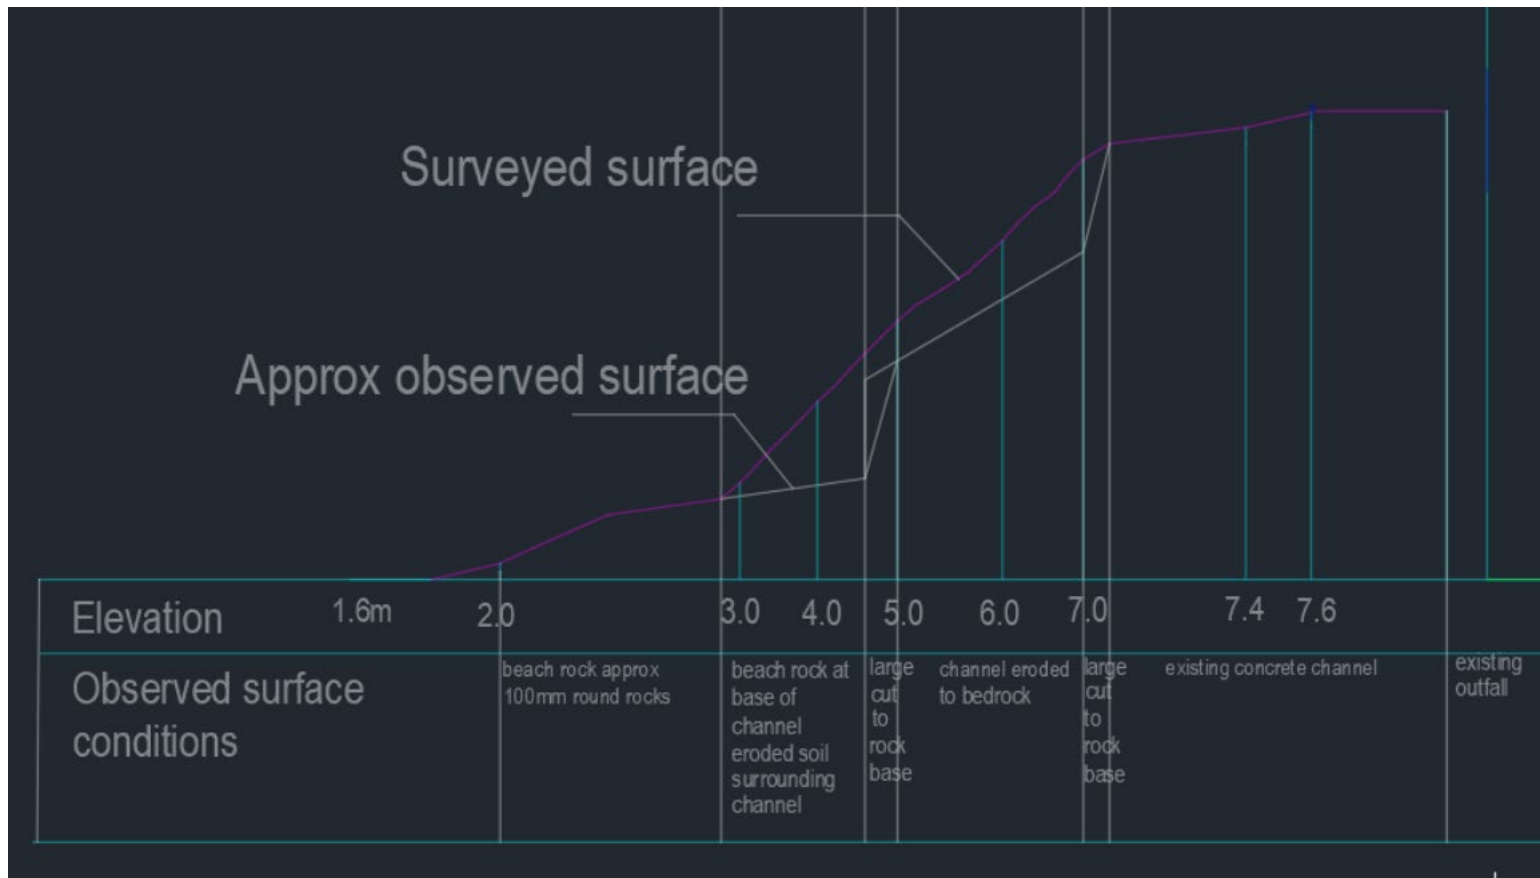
Detail of Survey cross section showing surveyed grade and possible actual grade.
